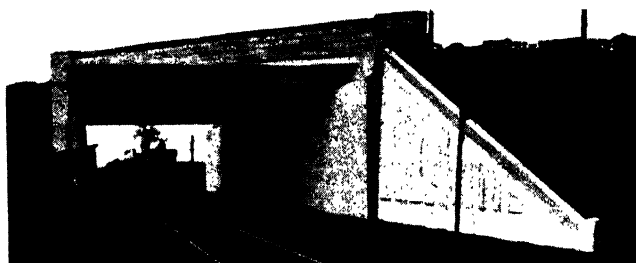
BRIDGE AT MALTON GATES, NORTH RIDING.
